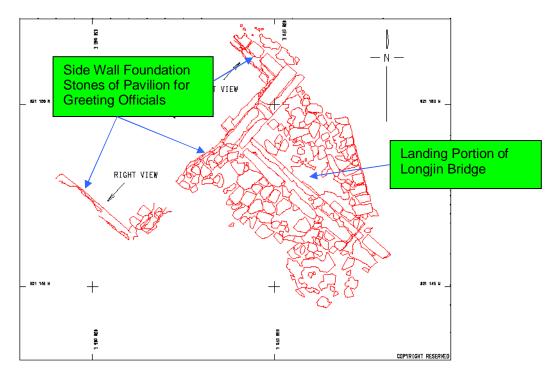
Plan of Pavilion for Greeting Officials and Landing End of Longjin Bridge
